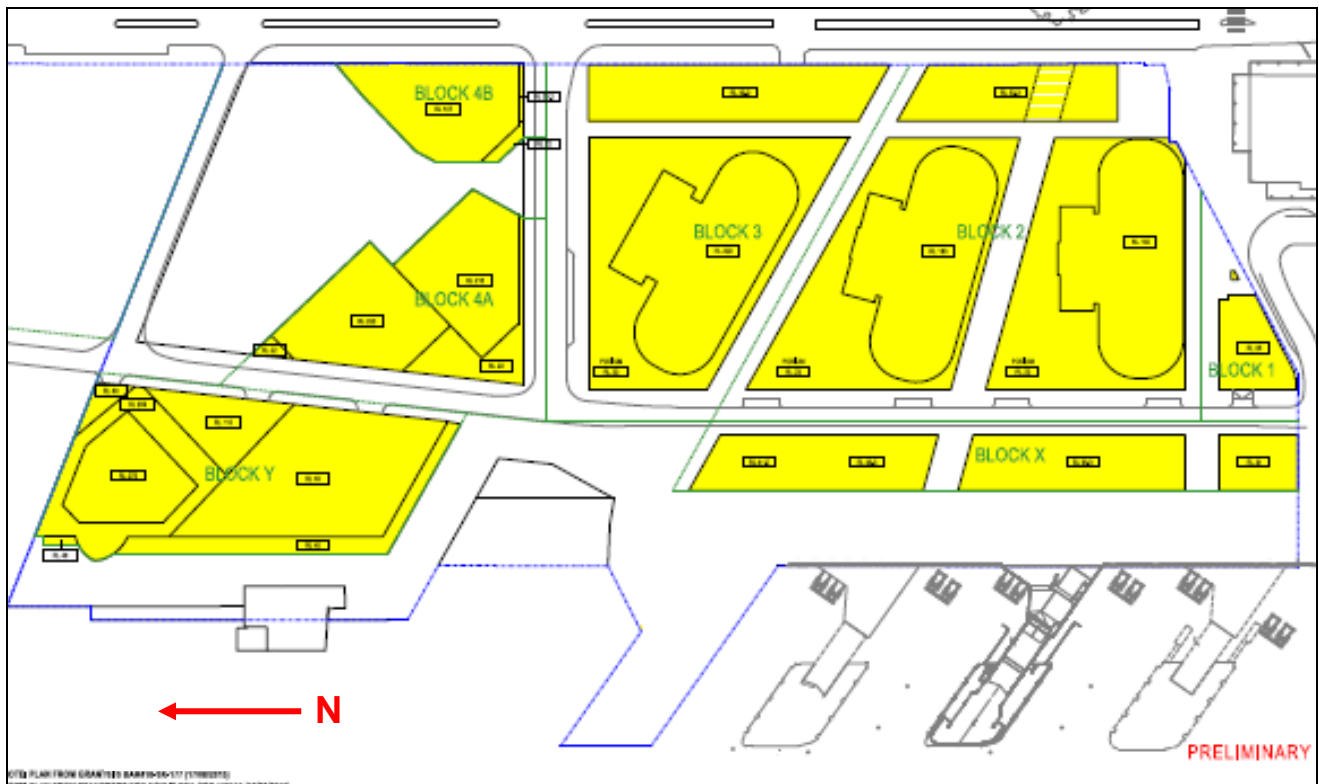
Amended Building Envelope Plan (Source: RtS/PPR)
